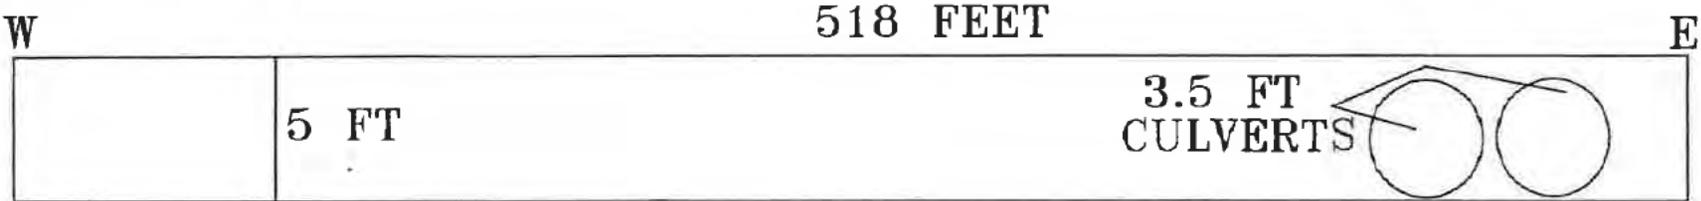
TYPICAL CROSS-SECTION OF PROPOSED DETENTION BASIN
